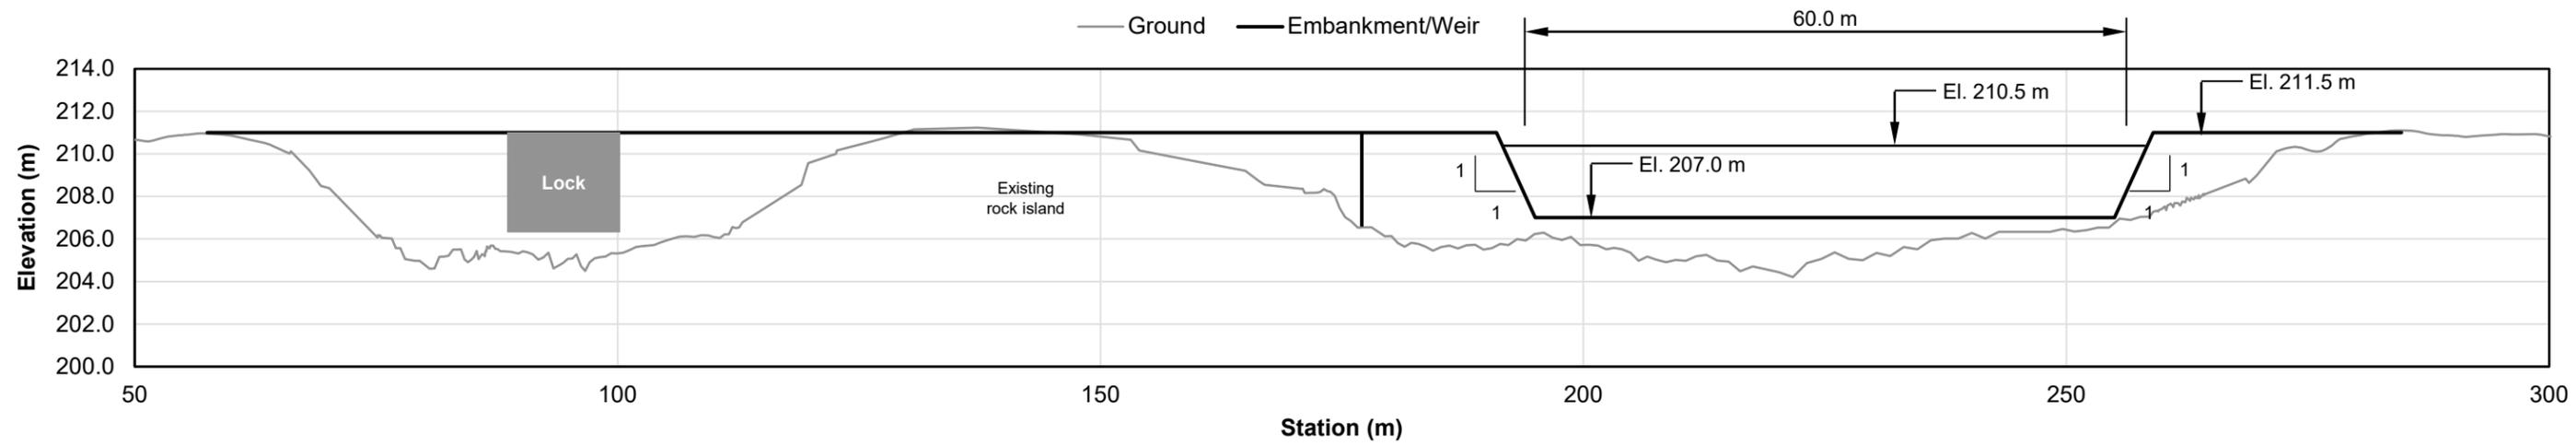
presents an alternative concept plan and profiles for a stop log structure and rockfill embankment. The proposed works would also consist of a 60 m wide control section spanning the channel south of the existing rock island. A cast in place concrete foundation is required to support the vertical slots as it is unlikely that the supports can be pile-driven into the riverbed at this site. As for the rubber dam option, the foundation would be constructed on the rockfill base that was left in the channel after removal of the rock weir at that location in 1975. Additional rockfill would be required to raise and level the base to about 206.5 m before the concrete is poured. The remaining portion of the channel would be blocked by a rockfill embankment having a design crest elevation of 211.5 m to prevent overtopping.
